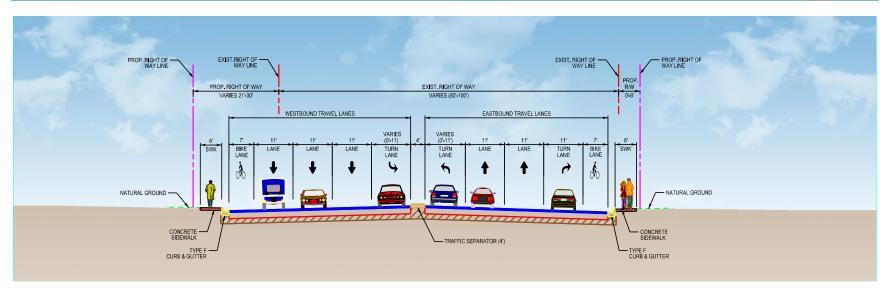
Typical Section - Lantana Road from Shopping Center Dr to Andrew Redding Road
